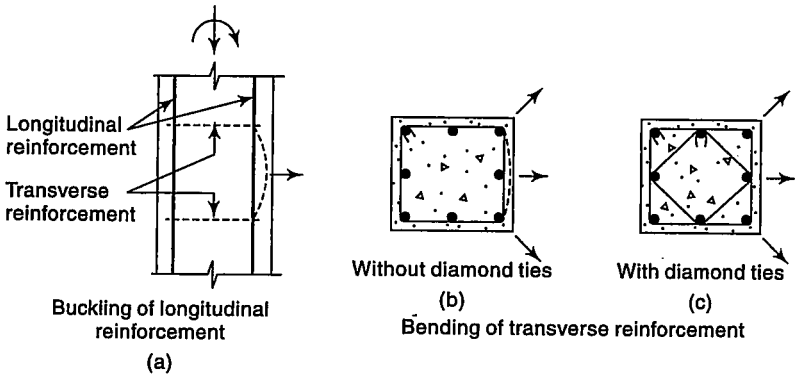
Effect of transverse reinforcement in preventing the buckling of the main reinforcement
